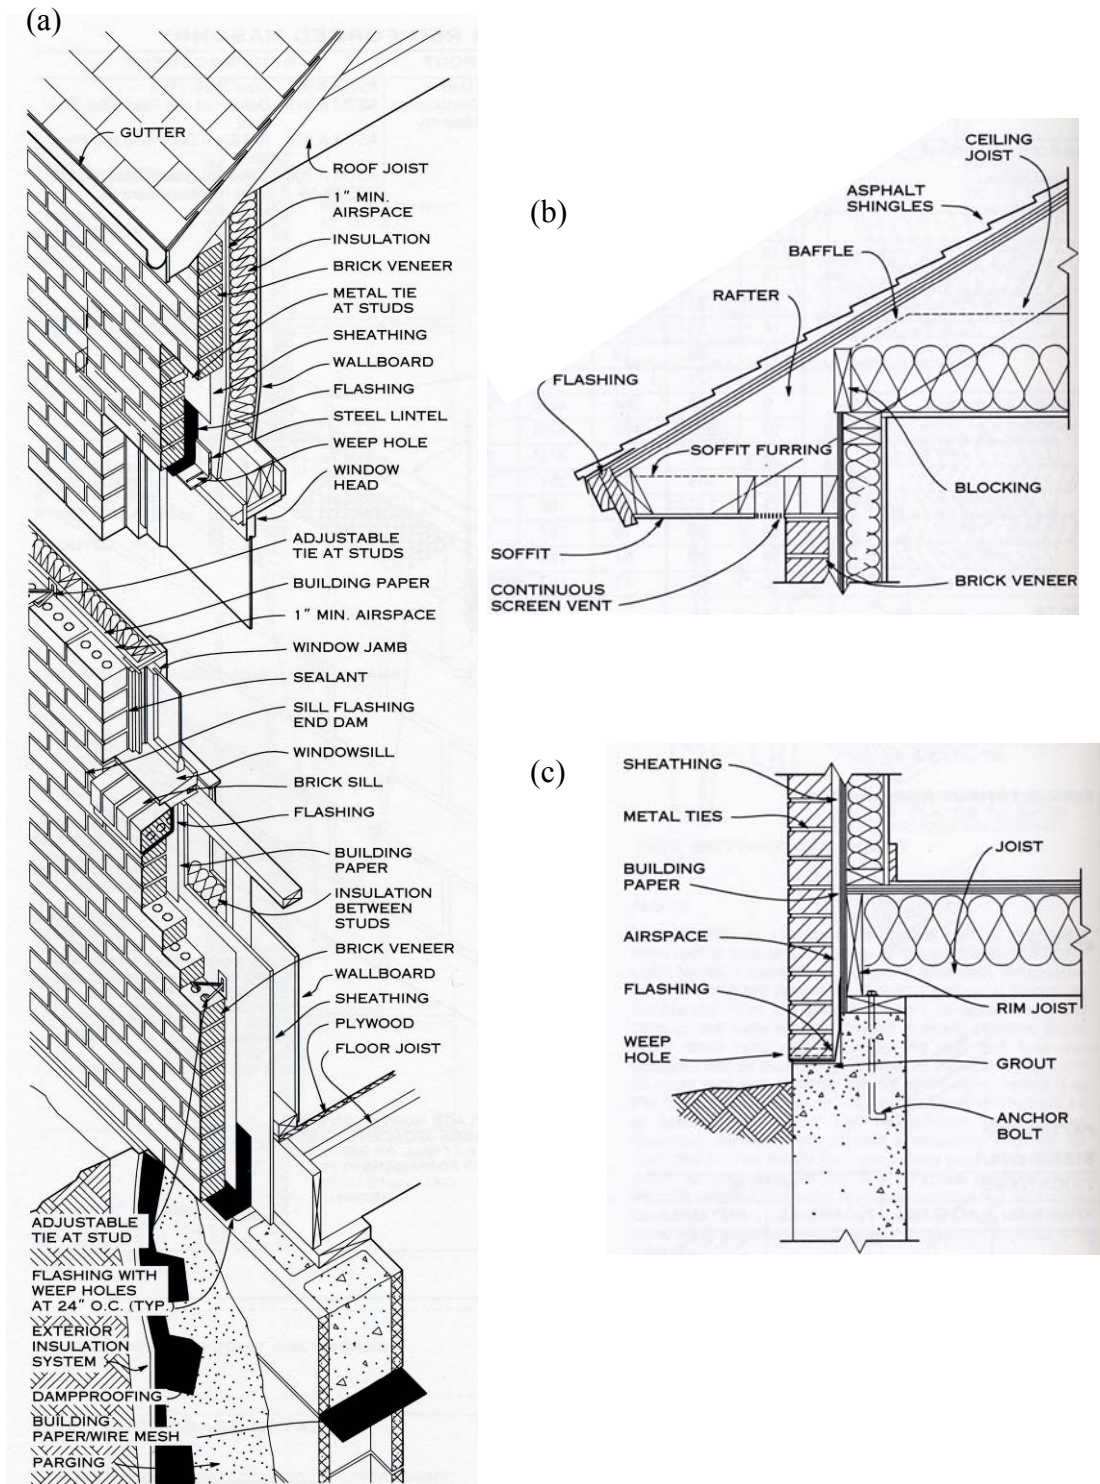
Typical details of brick veneer on wood frame home construction (Rumbarger and Vitullo 2003).
